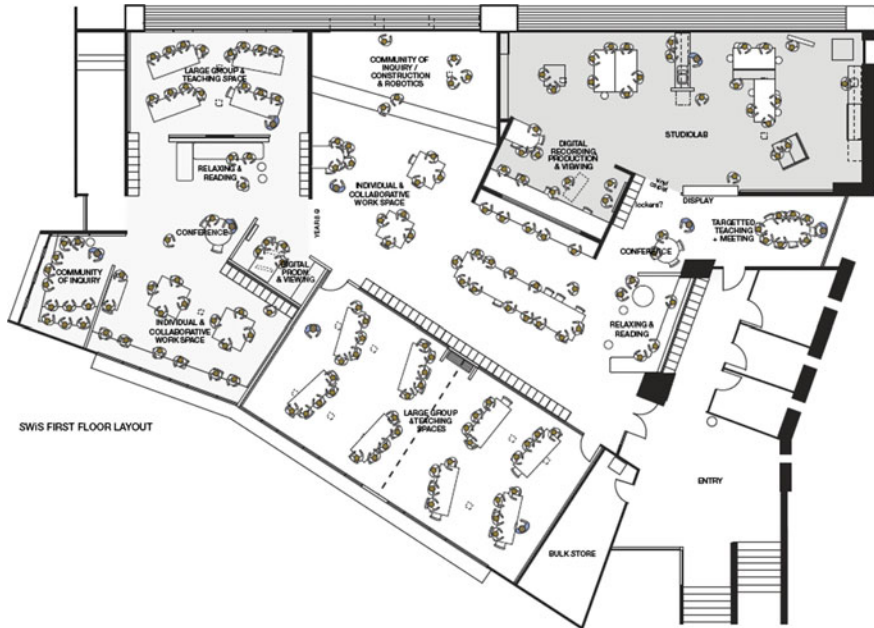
Suburban High School, School Within School (SWiS) building first floor plan (image: Hayball & Mary Featherston Design)
